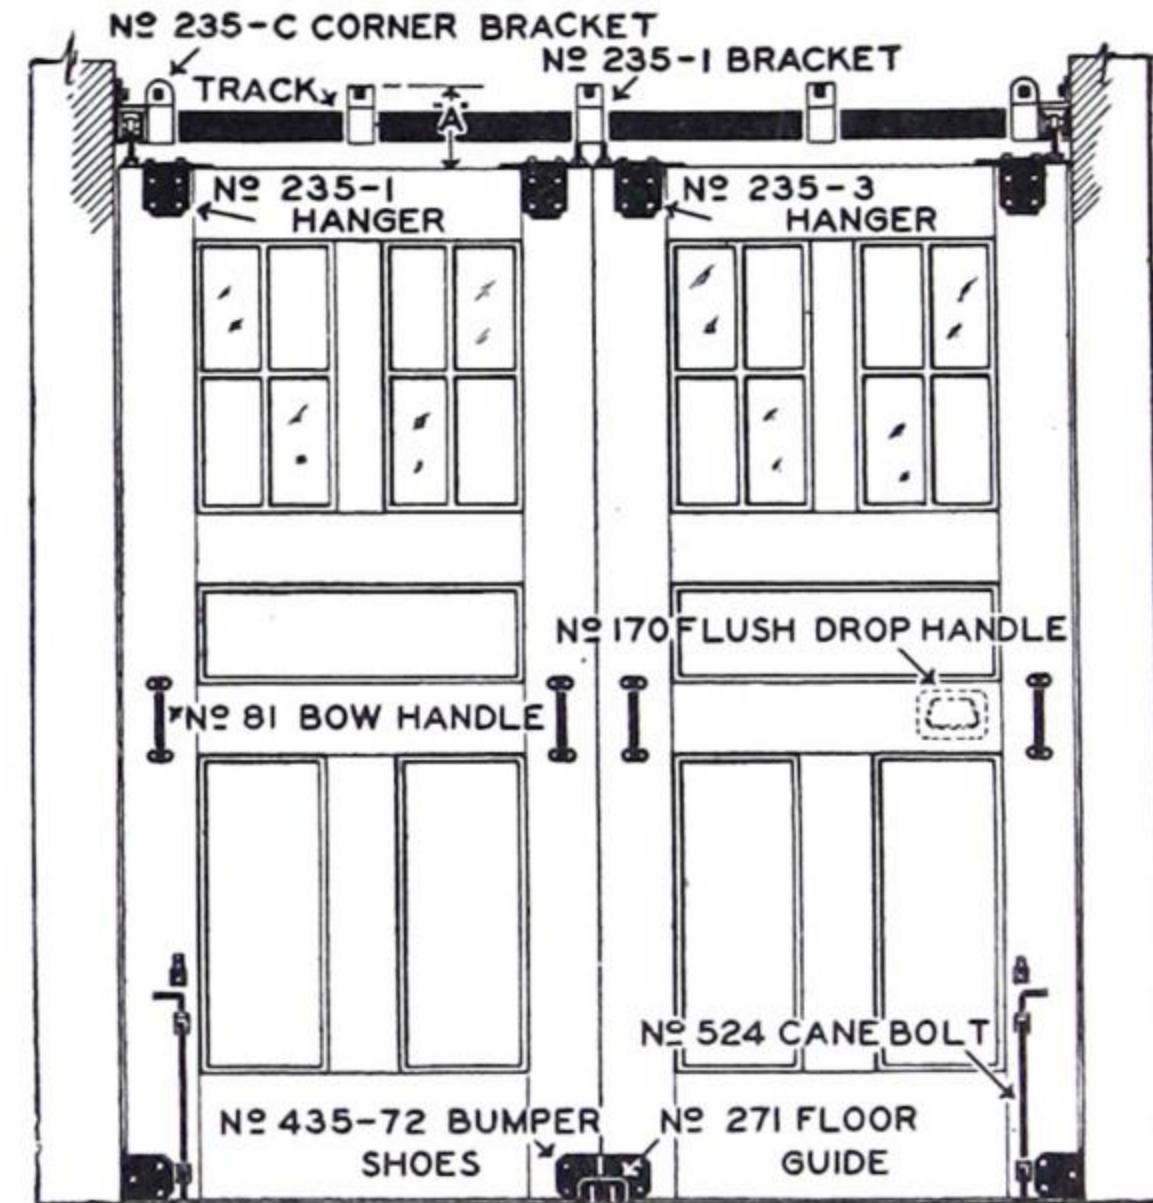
Interior elevation showing proper location and names of 235 Parts for DD-1 Sets, including two 524 Cane Bottom Bolts.
